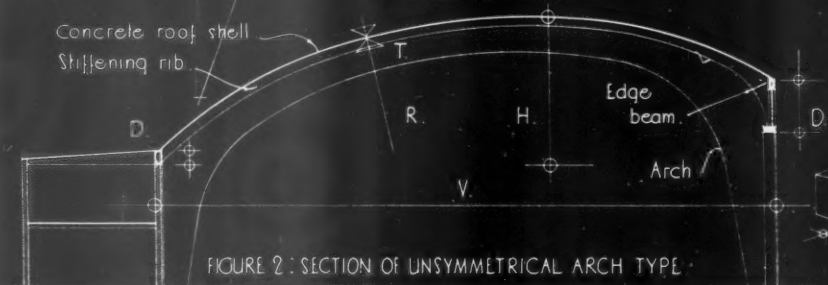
SECTION OF UNSYMMETRICAL ARCH TYPE
